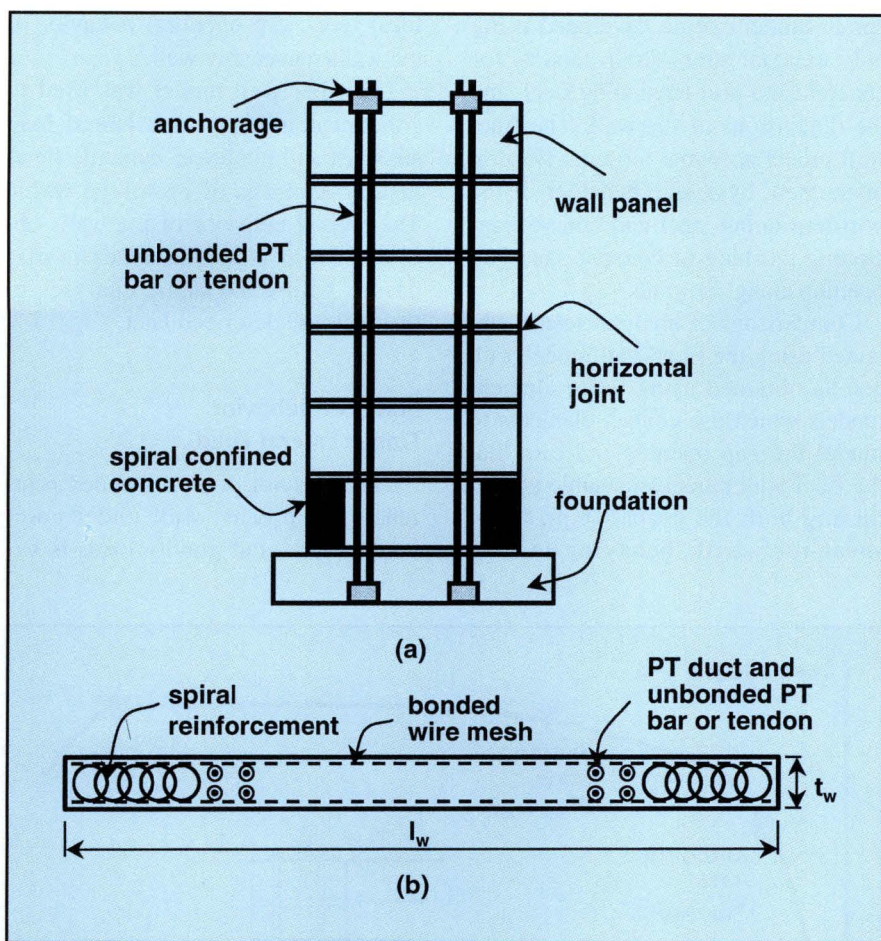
Unbonded post-tensioned precast wall: (a) elevation; (b) cross section near base (enlarged).
